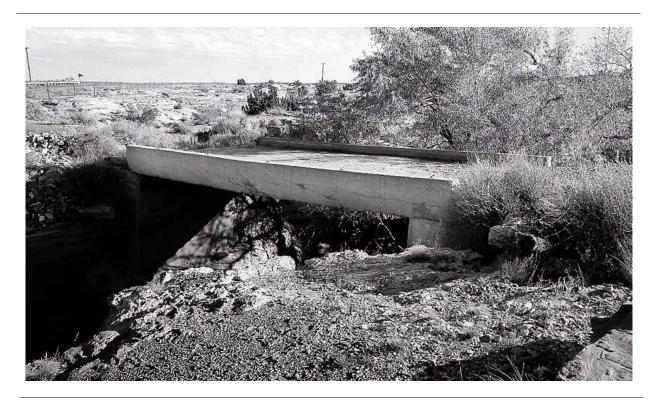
Jacks Canyon Bridge, 2002 (note: bridge is presently abandoned, with its steel guardrails removed).
